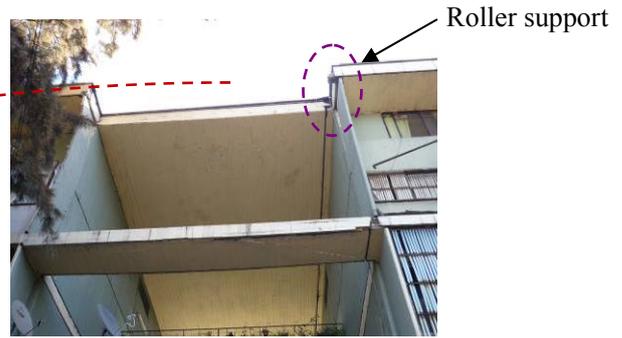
Drop of beam (Photo 12-5 reprinted)
